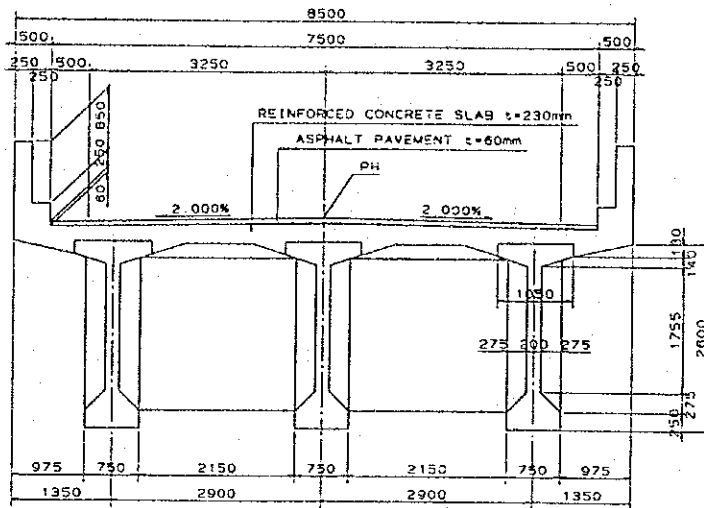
Typical Cross-section of Superstructure (Span length = 40 m)
